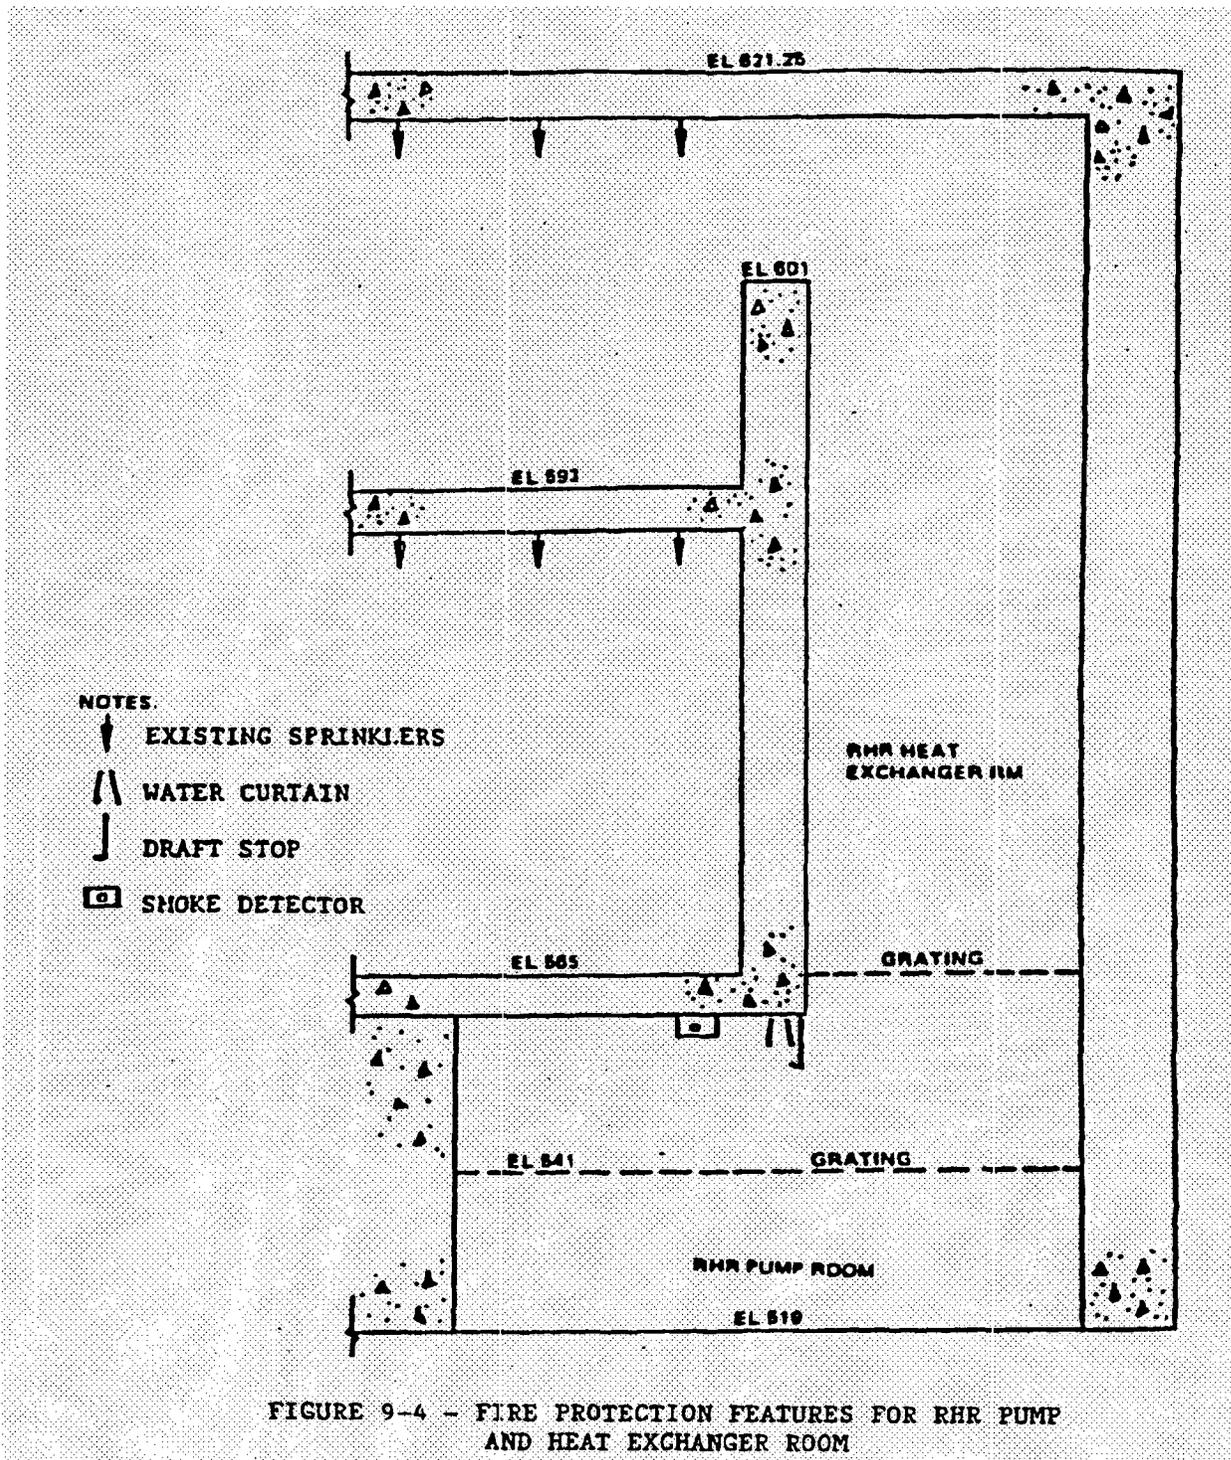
FIRE PROTECTION FEATURES FOR RHR PUMP AND HEAT EXCHANGER ROOM
